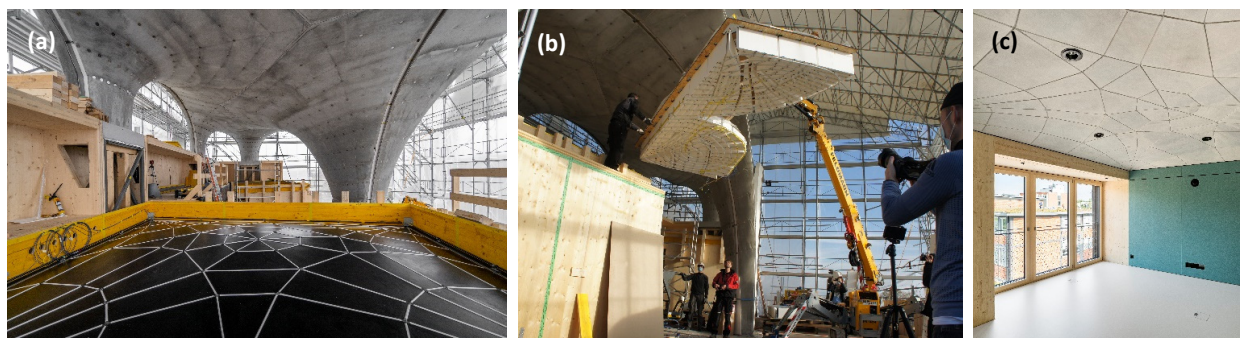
HiLo funicular floor: (a) bottom temporary formwork; (b) top polyurethane stay-in-place formwork; (c) bottom view of final slab. Photos by Juney Lee.
